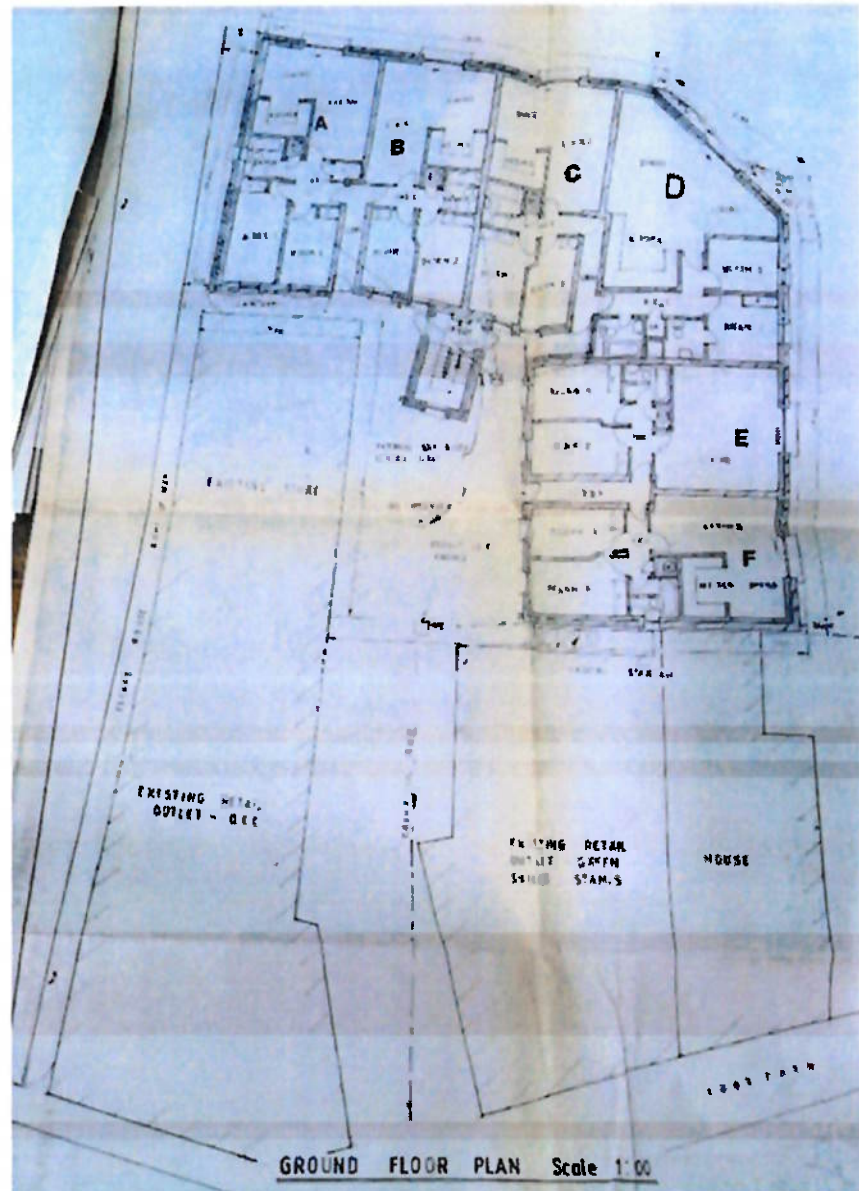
Ref: 91/16589 floor plan – Note No. 14a as 'Existing Retail Outlet (Green Shield Stamps).
